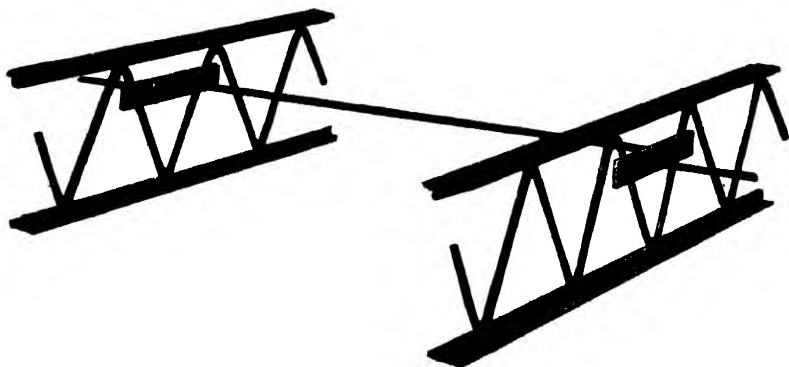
,692.—Showing method of sag rod connection in steel joists. When open truss steel joists are used as purlins on pitched roofs and are placed at right angles to the slope, sag rods are generally necessary, and these require sag rod plates attached to the joists. The plates are welded to the web members of the joists as illustrated.
